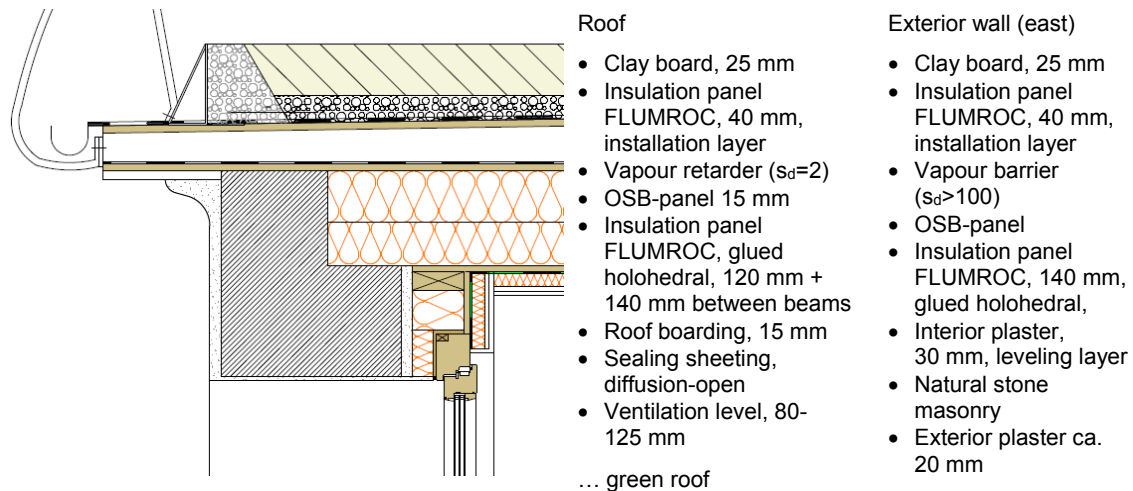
Green roof and eastern façade section view with window integration detail. Description of layers from inside to outside.
